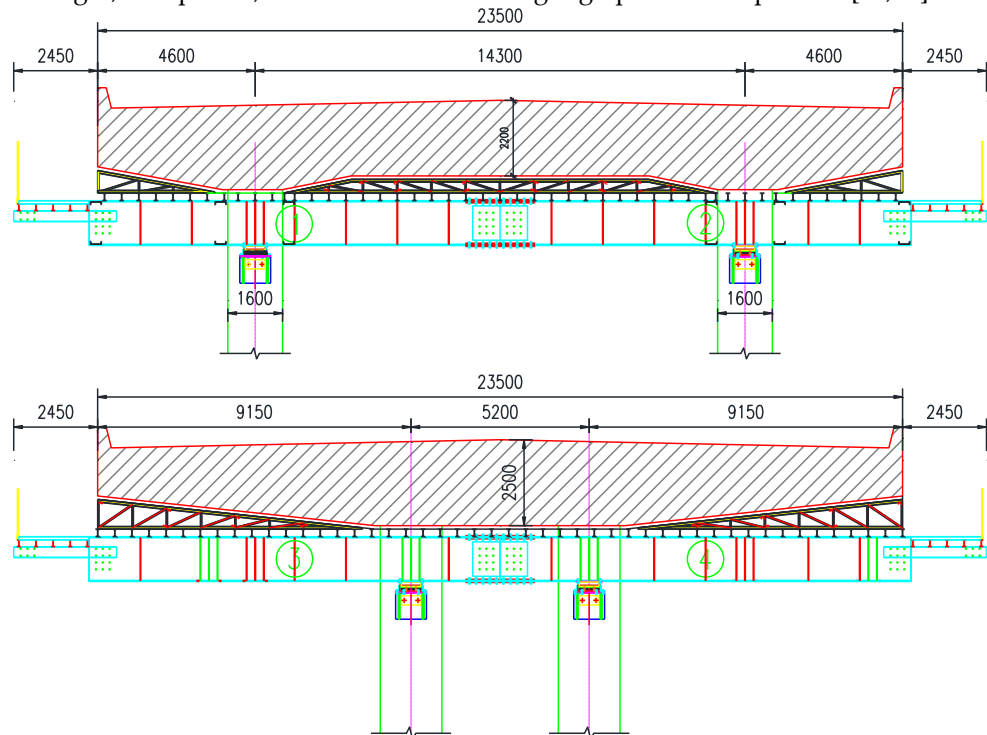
Schematic diagram of the ground-free steel support (unit: mm)
